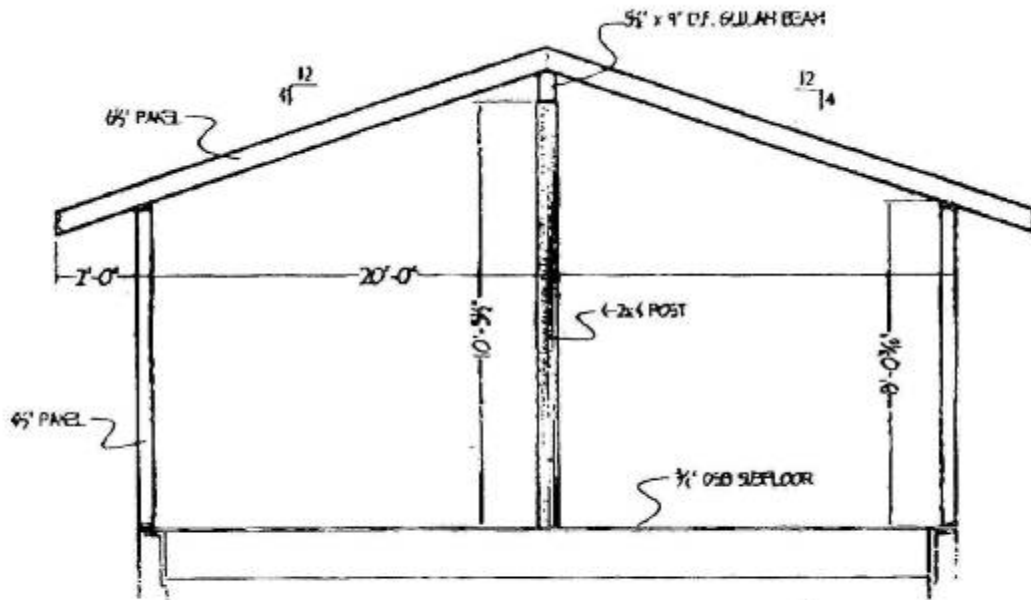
ZEH4 SIP north wall elevation cut drawing.
